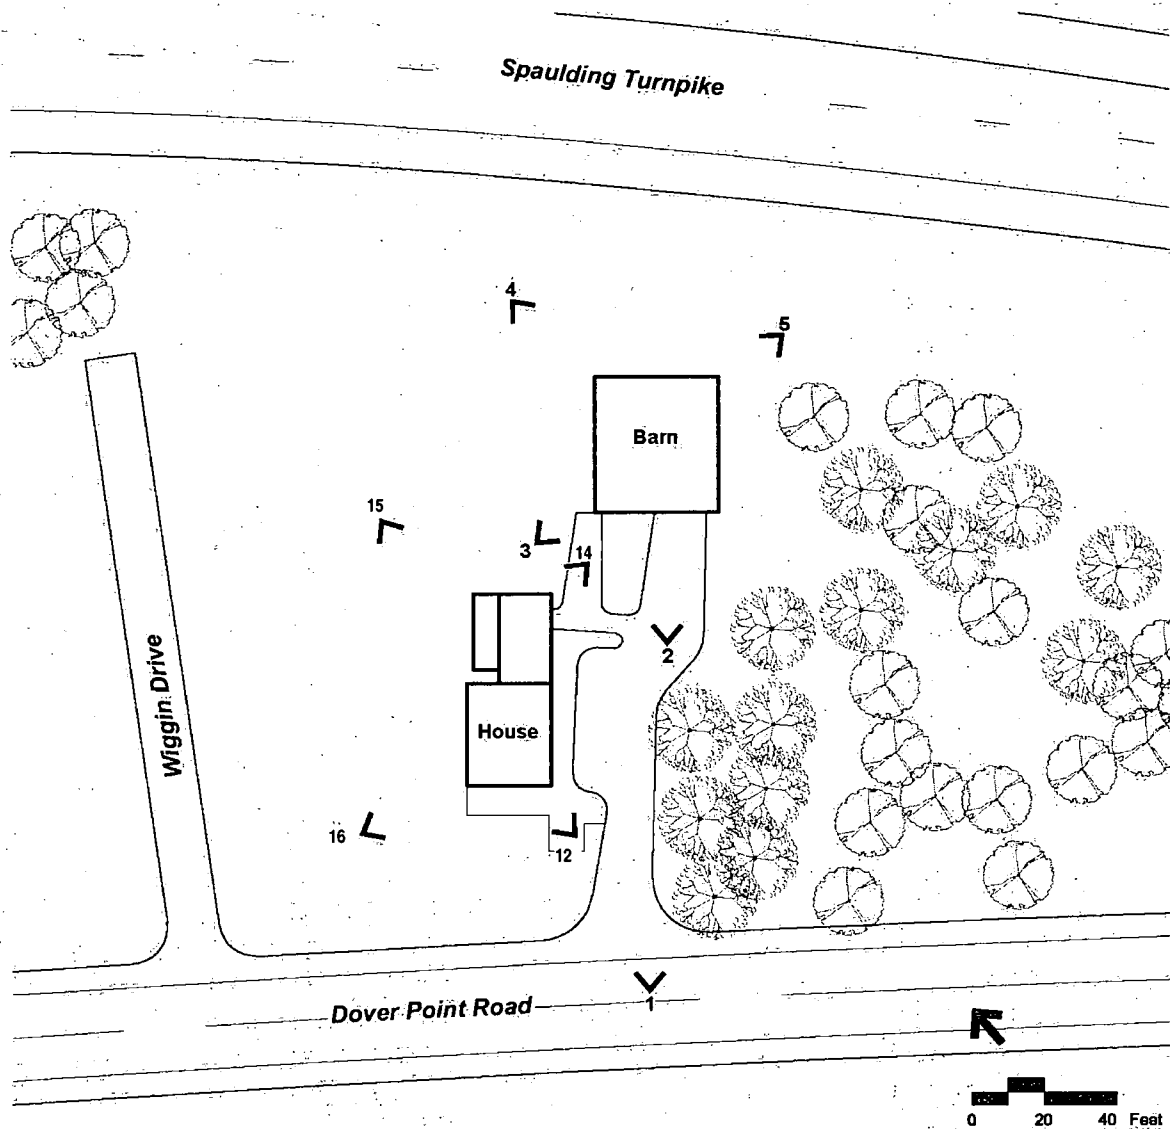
Site plan with locations of photographs #1-5, 12, 14-16
